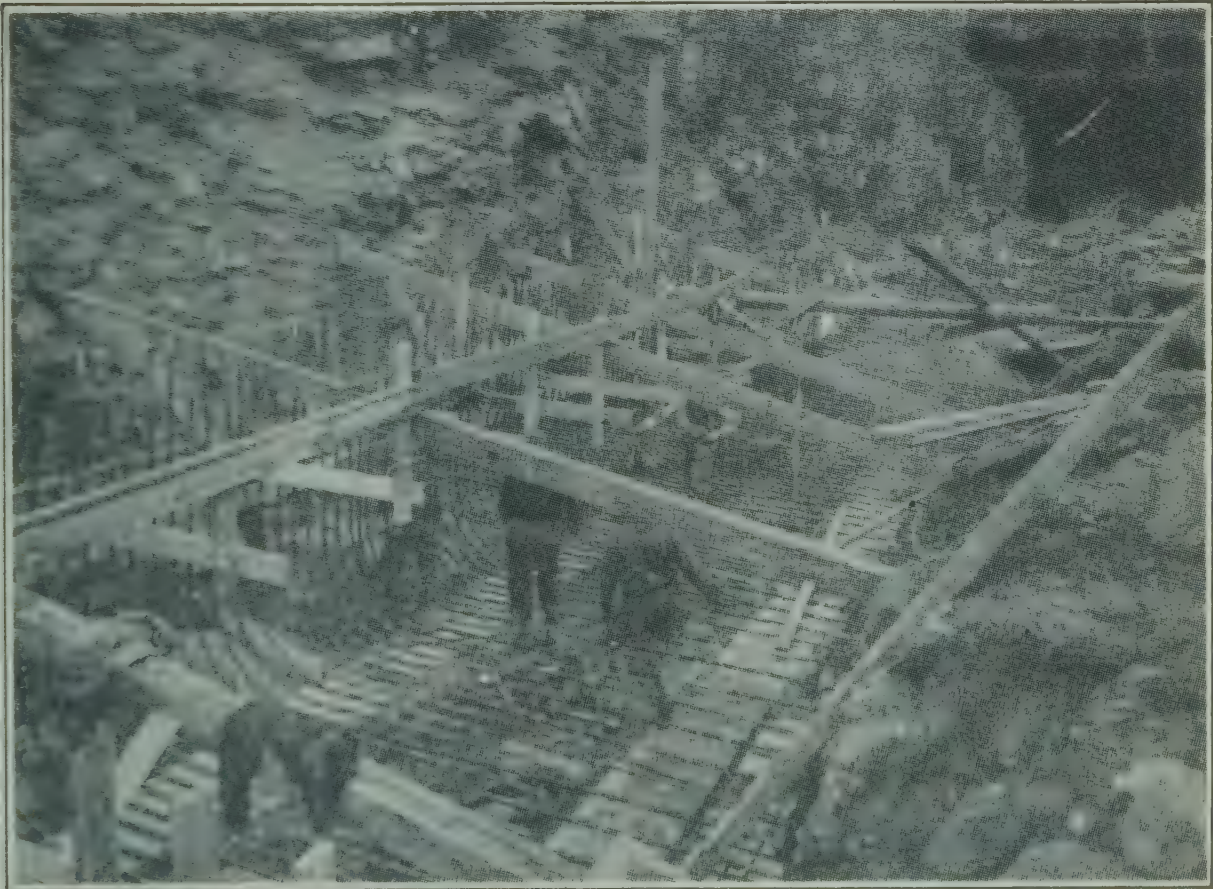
Placing reinforcement in the footing of a retaining wall, Lincoln Tunnel, New York City.
